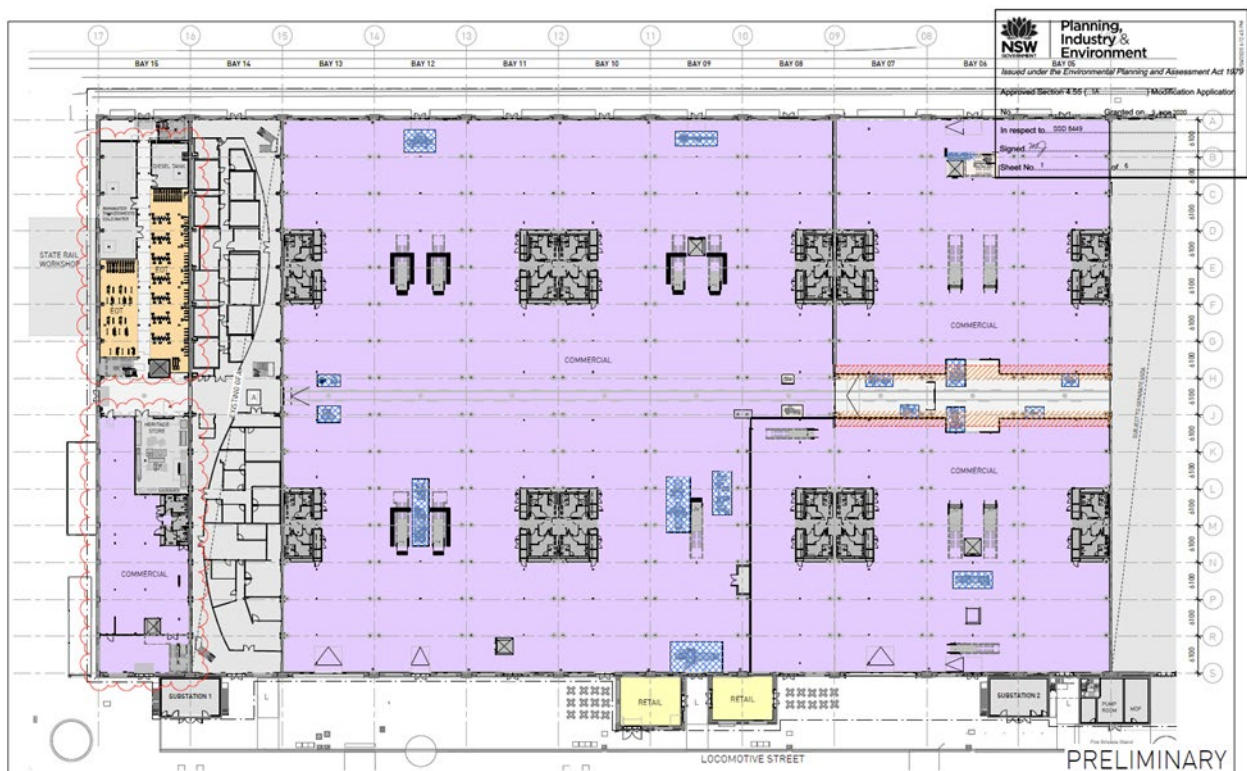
Last Approved Ground Floor Plan – Bay 15
